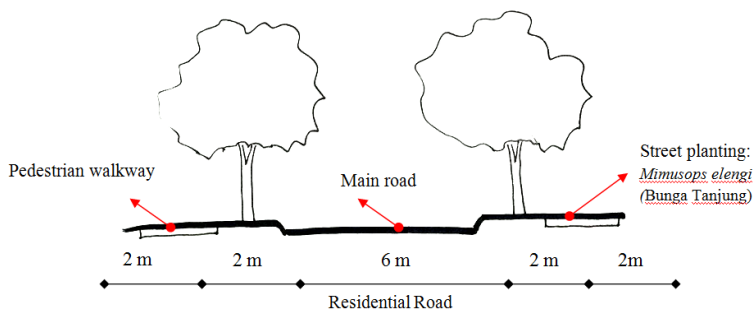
Type A, street planting in between road and pedestrian walkway
